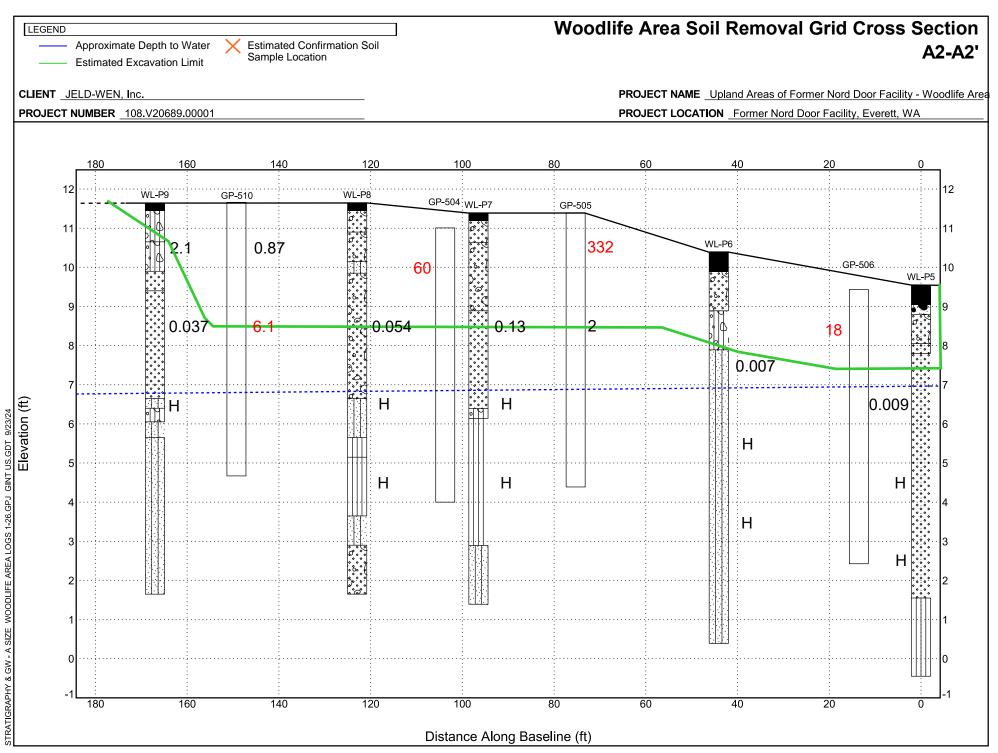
FIGURE WOODLIFE AREA CROSS SECTION PLAN
